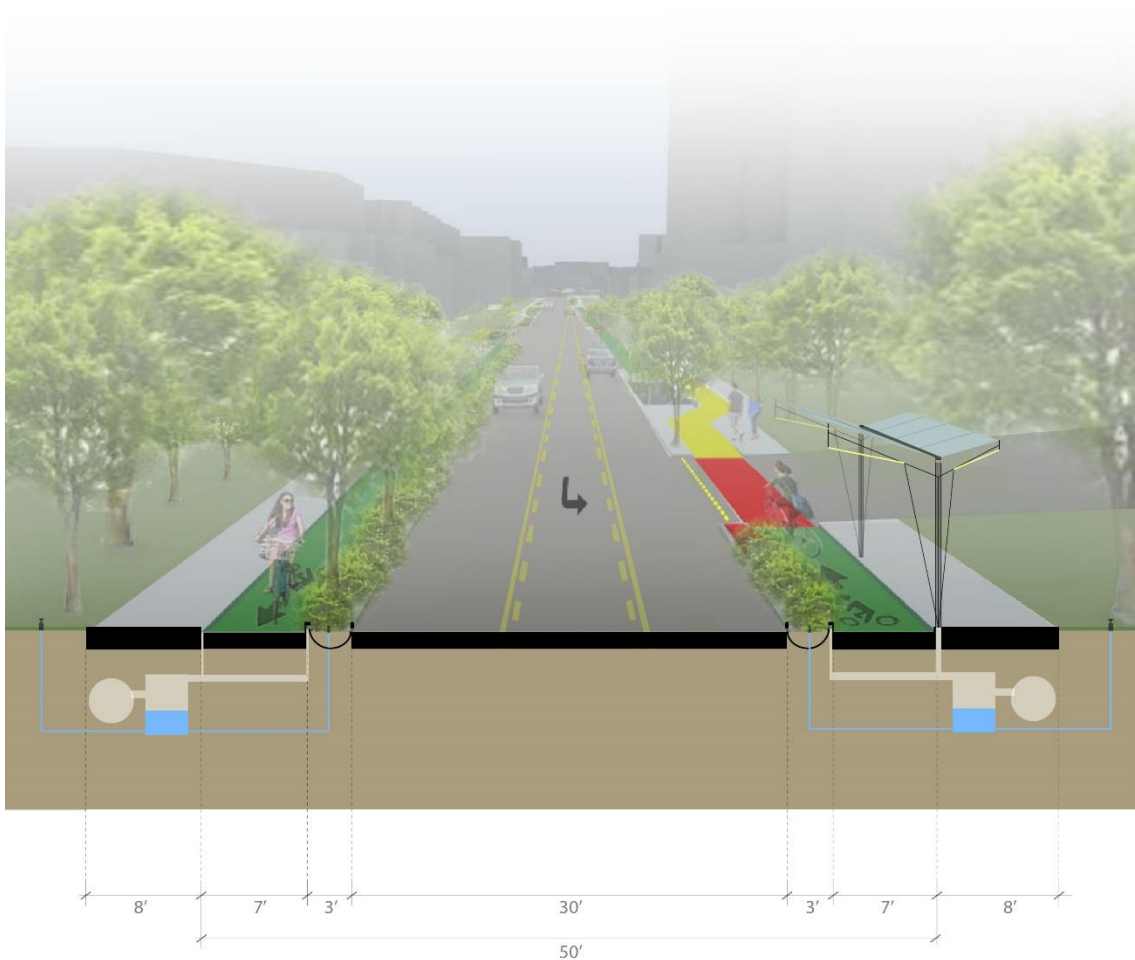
South Street Section Perspective at Ala Moana Blvd. and South St., Looking North (mauka).
